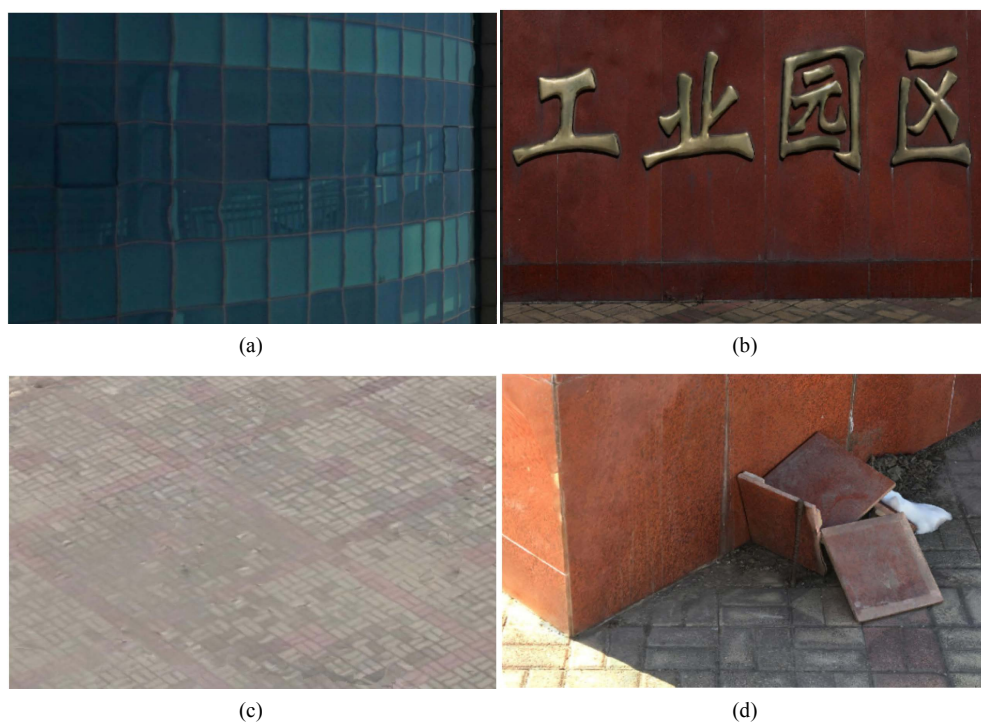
The details of three-dimensional model, (a) glass curtain wall, (b) mark wall, (c) on the ground, (d) corner of wall
